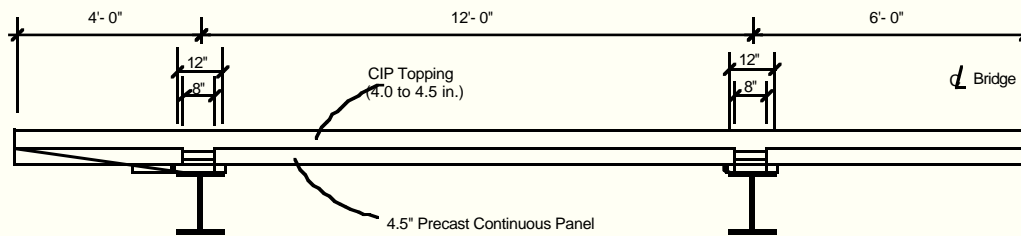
Cross-section of the bridge (1.0 ft = 304.8 mm, 1.0 in. = 25.4 mm).
